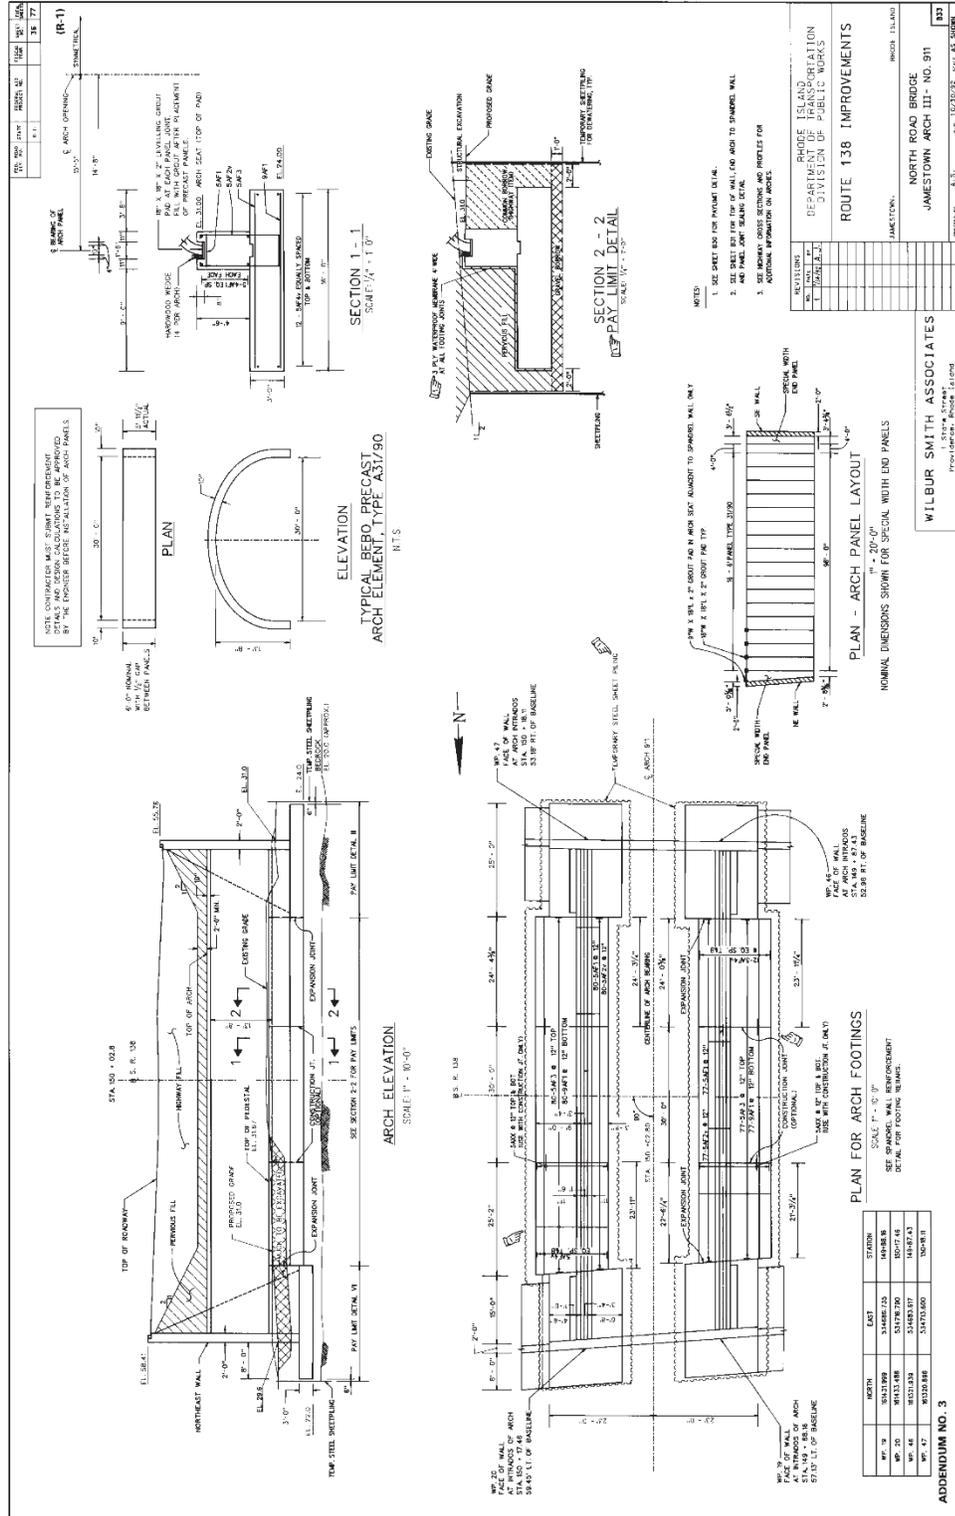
Arch III Construction Plan II (provided by RIDOT)
